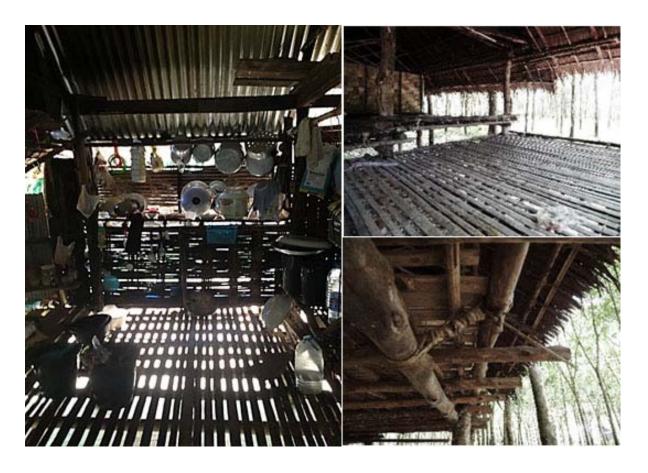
Kitchen area with shelf and bamboo floor (left), Bamboo floor steps (right-top) and joint details (right-bottom)
